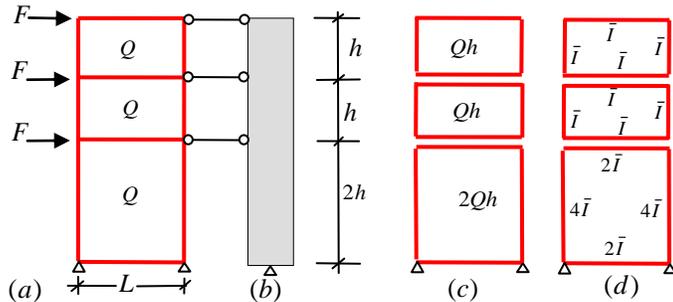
(a) 3-story MFUS and story shears, (b) Rocking wall(c) Module racking moments, (d) Assigned sections
